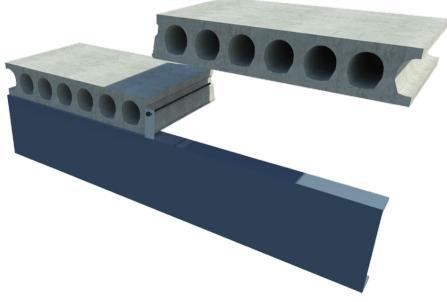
Detail of hollow-core floor to beam joint at the side of the building and implementation of the rebar in the joint between two hollow-core slabs
